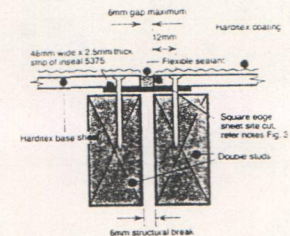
Horizontal overlap relief joint detail alternative 3
